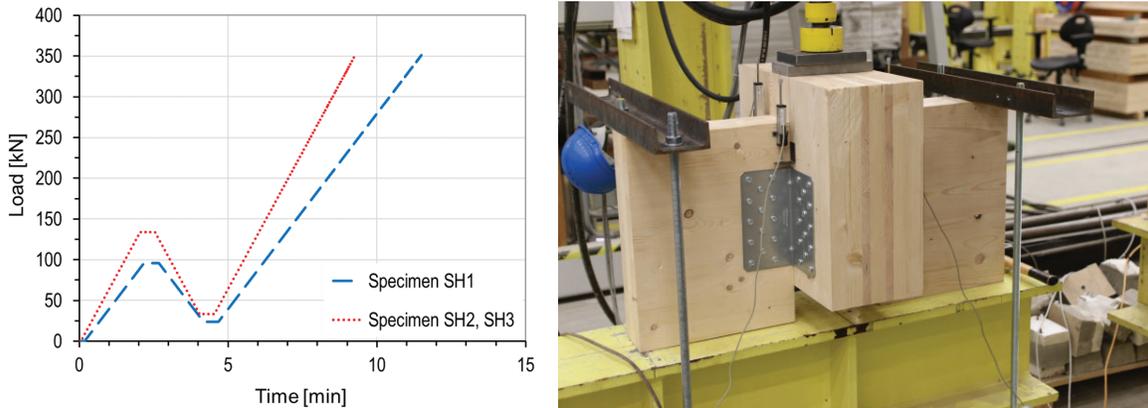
Loading diagram of the shear connection tests (left), test specimen under loading during the experiment (right).
